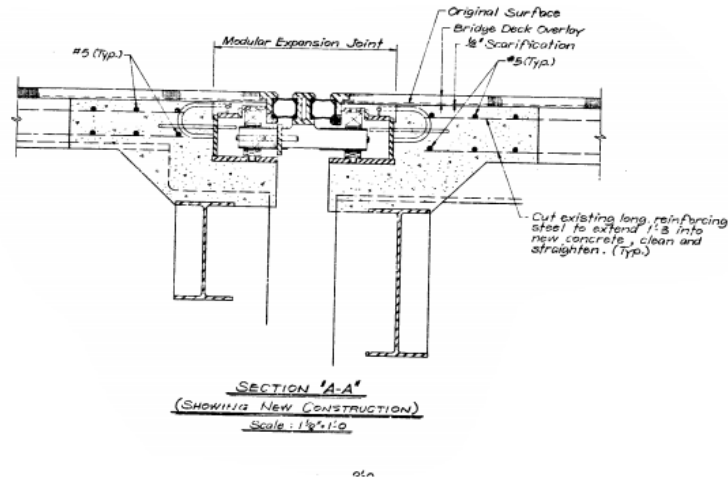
Expansion Joints over Piers 5 and 8 for the Bridge (NBI 33240) (1978)
